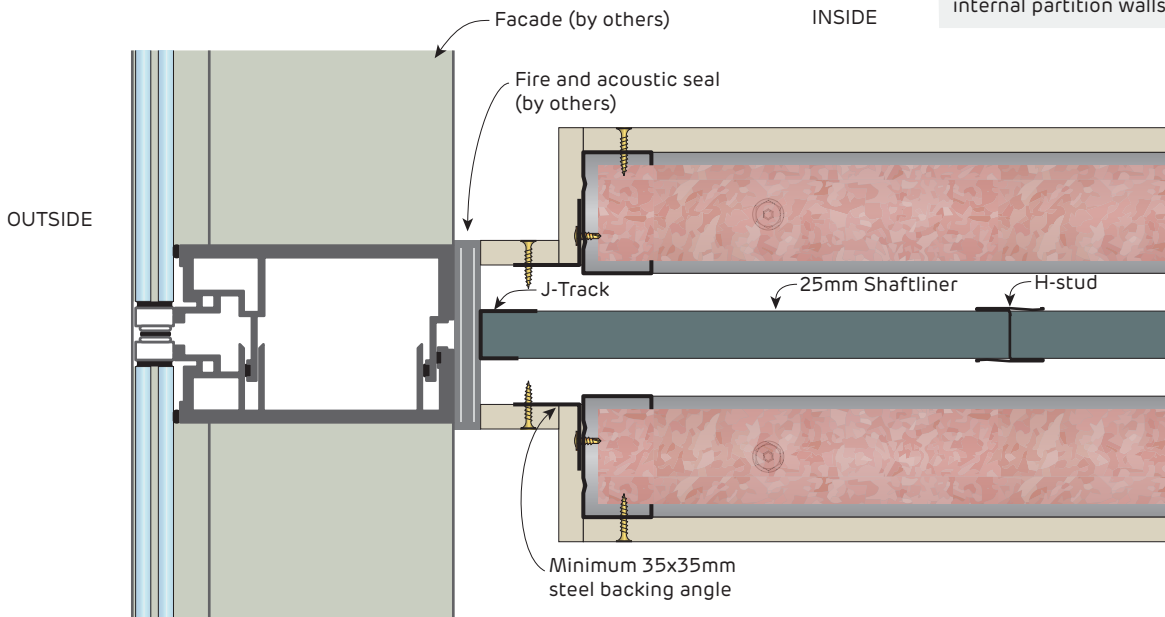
InterHome High-Rise Wall Transition to Curtain Wall Mullion
